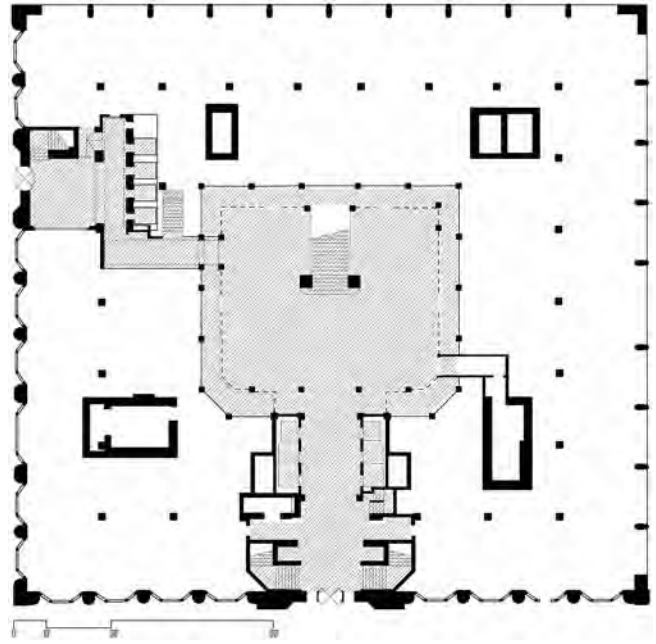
Ground floor plan, *The Rookery* (1885–1888), Chicago, Burnham & Root
